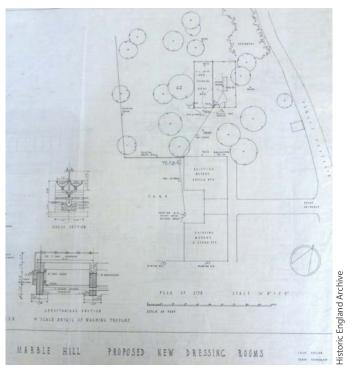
LCC plan for 'new dressing rooms', 1938. This block is located to the north of the Stable Block
